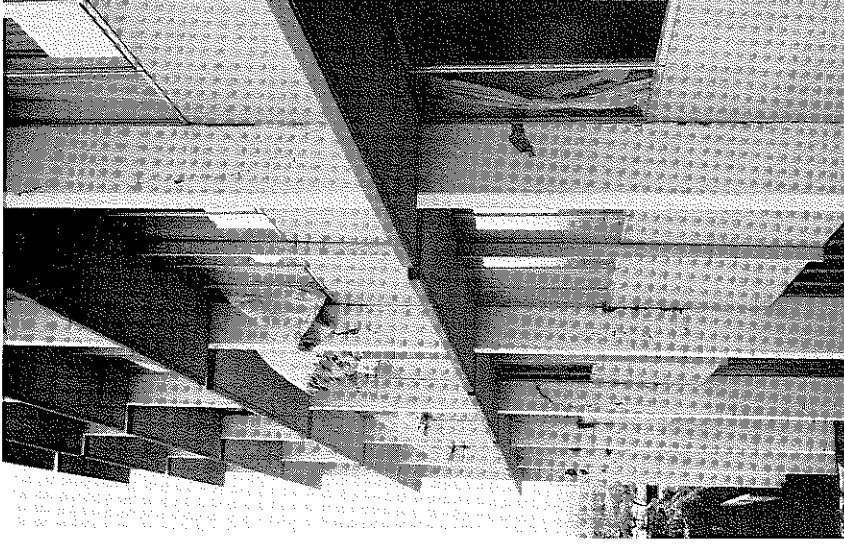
Exterior columns of Holy Cross Hospital with meandering cracks at points away from the floor connections.
